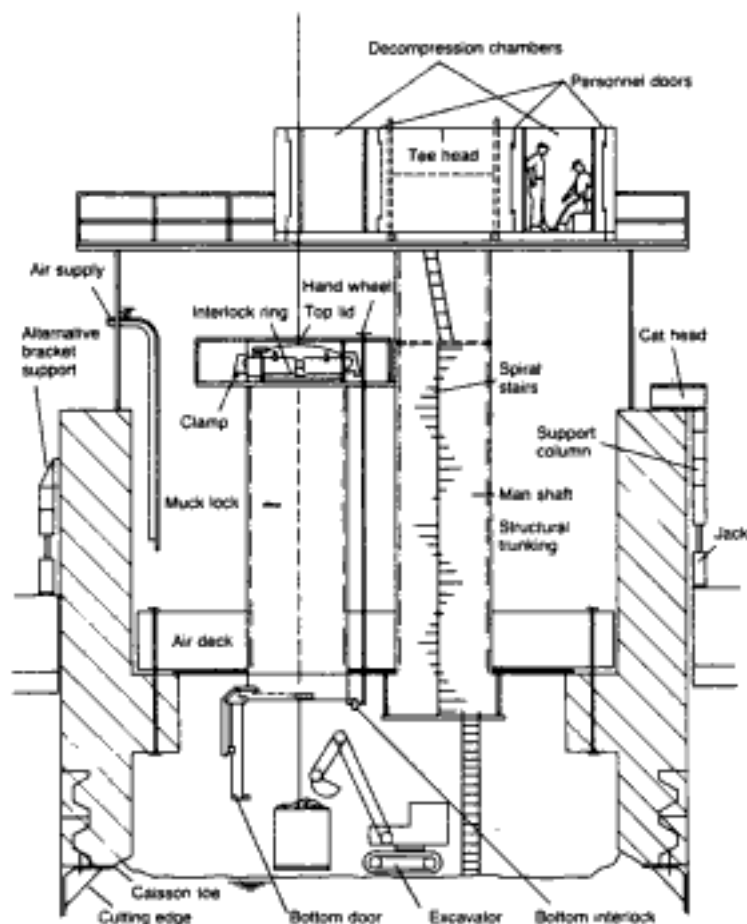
Cairo waste water scheme: cross-section of full-depth caisson showing personnel, mud locks and excavation (Flint et al.³¹)
